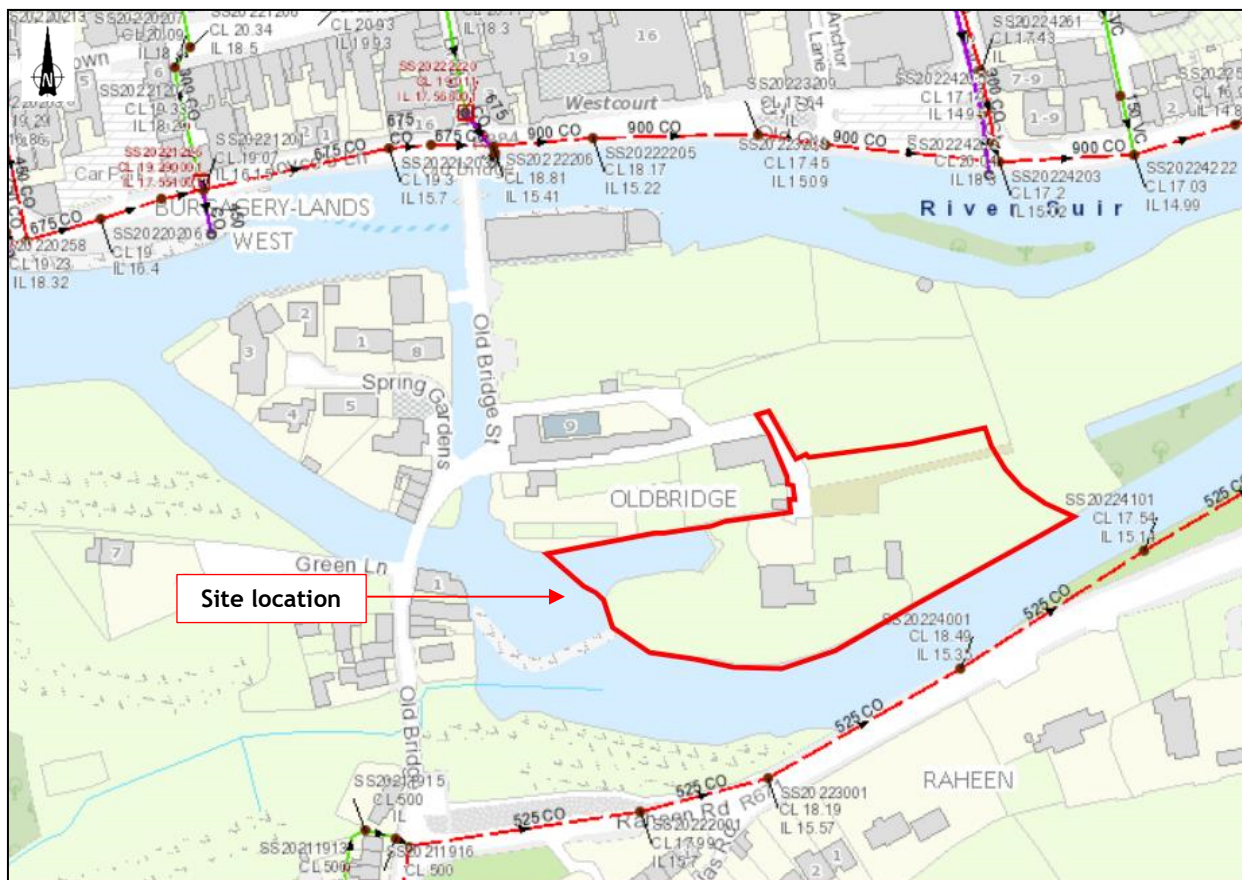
Existing foul drainage surrounding the site (Extract from Irish Water records)
